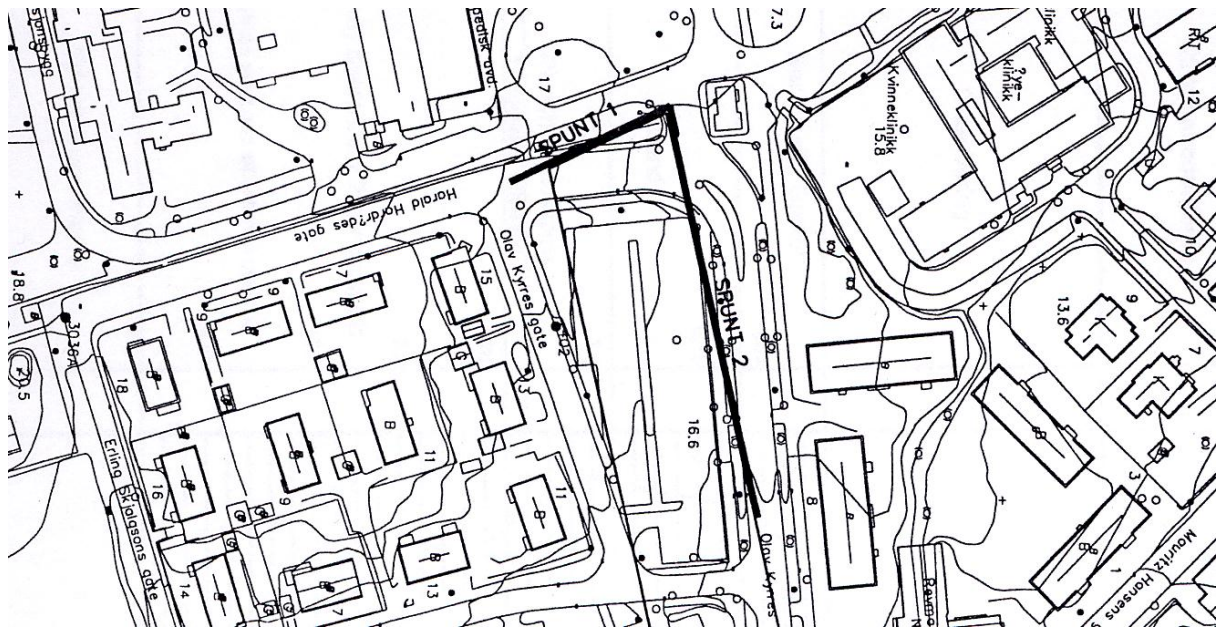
Overview of the hospital area with wall 1 (SPUNT 1) and wall 2 (SPUNT 2) (Rösand, R.H. 2000).
